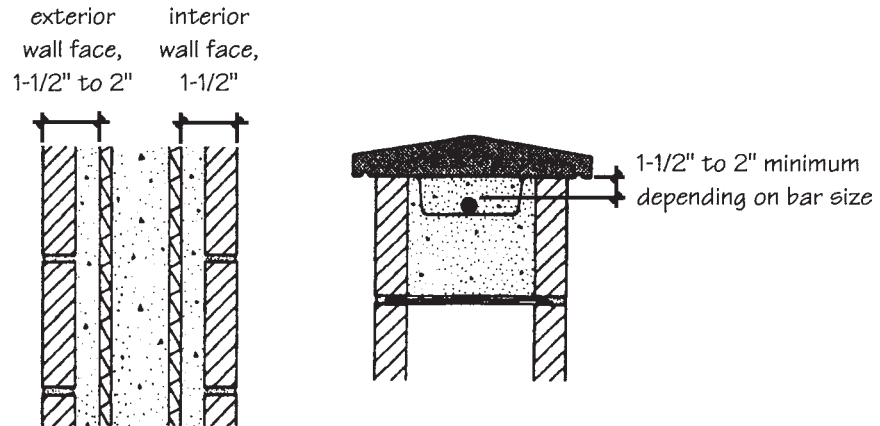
Code requirements for minimum masonry and grout cover for reinforcement. (Drawings from *Amrhein, Reinforced Masonry Engineering Handbook, 5th ed.*)
